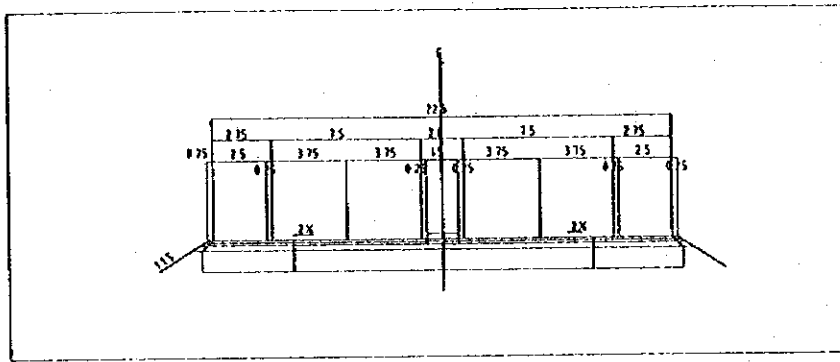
Typical Cross Section of NH-2 Widening Scheme
